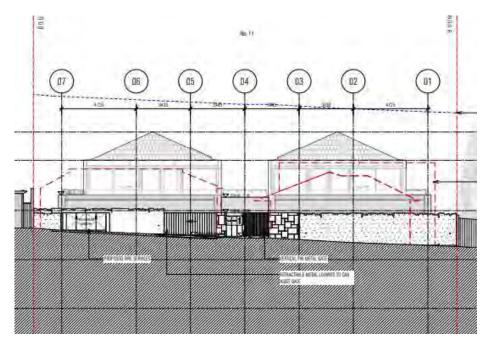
Northern elevation from Bennett Street (Mathieson Architects)
